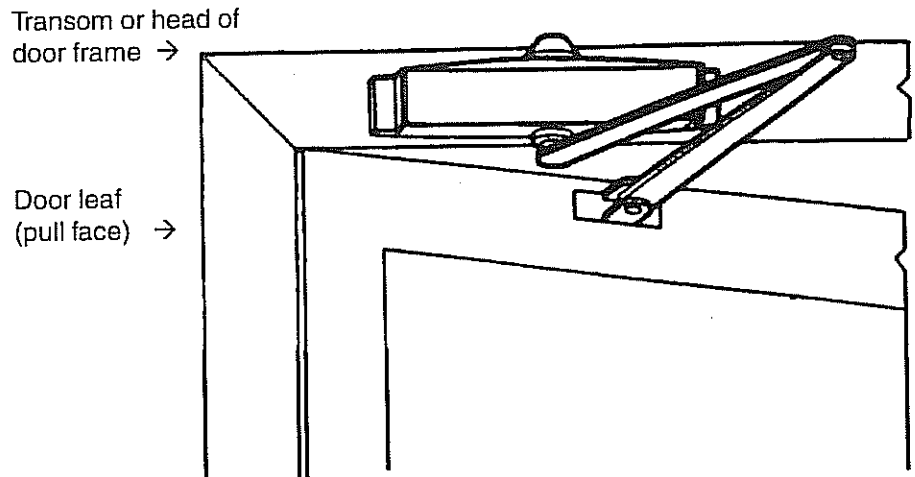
Face fixed overhead closer mounted on the transom with the arm bracket fitted to the push face of the door
